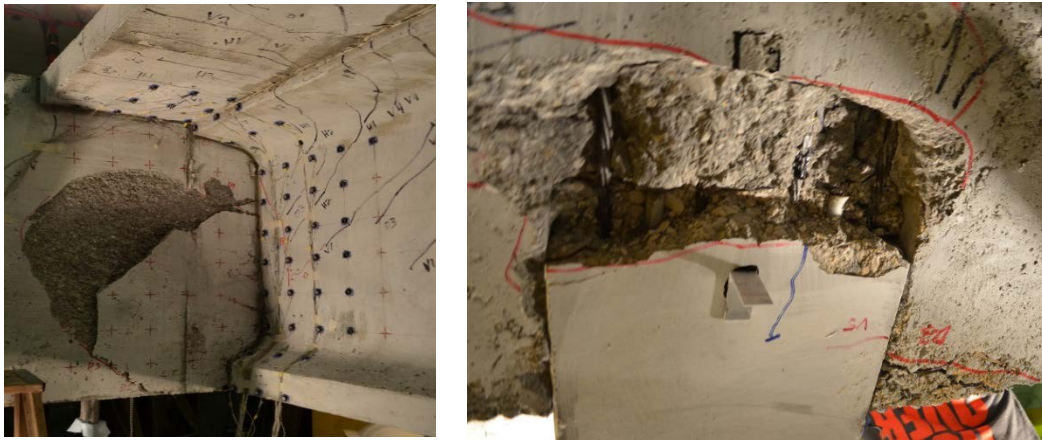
Spalling of cap and girder cover concrete
